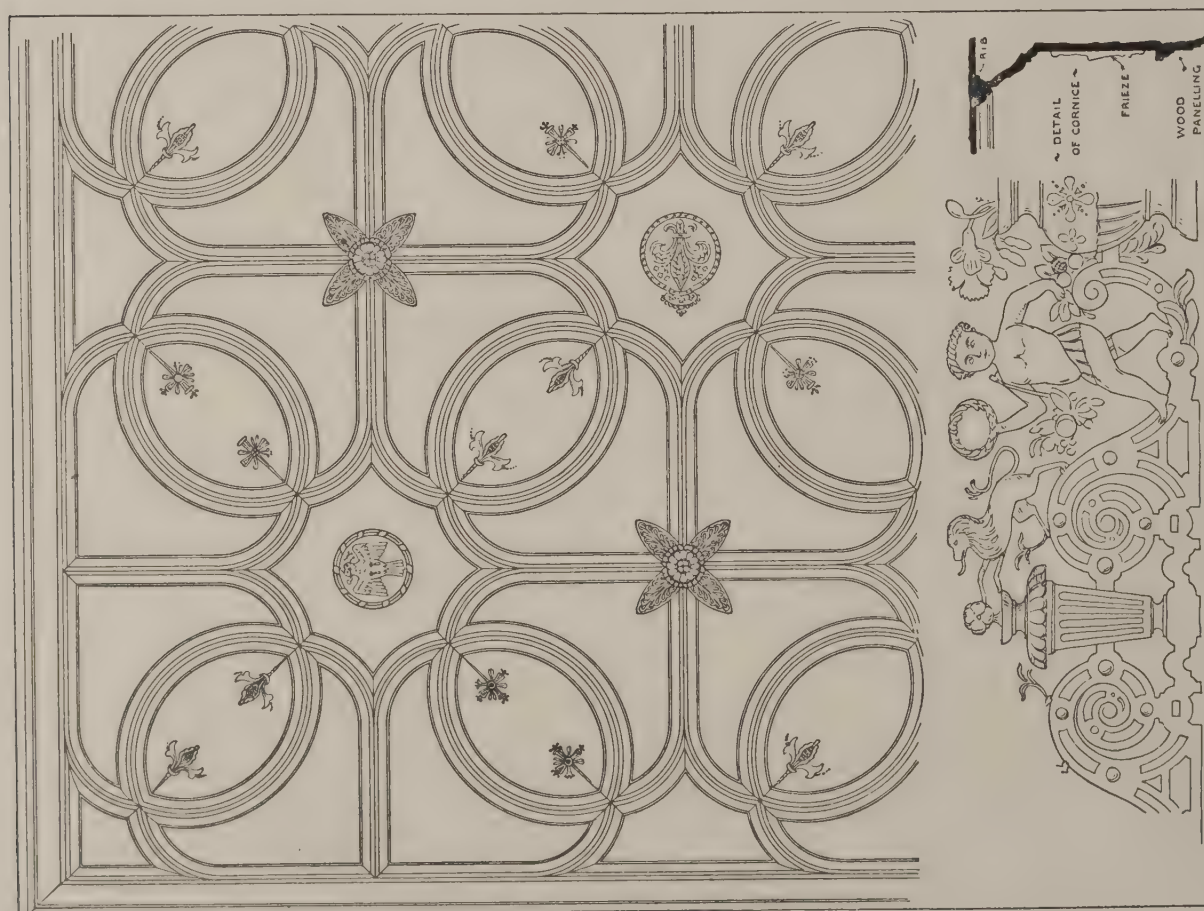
DETAIL OF PLASTER CEILING IN CHINTZ ROOM,
